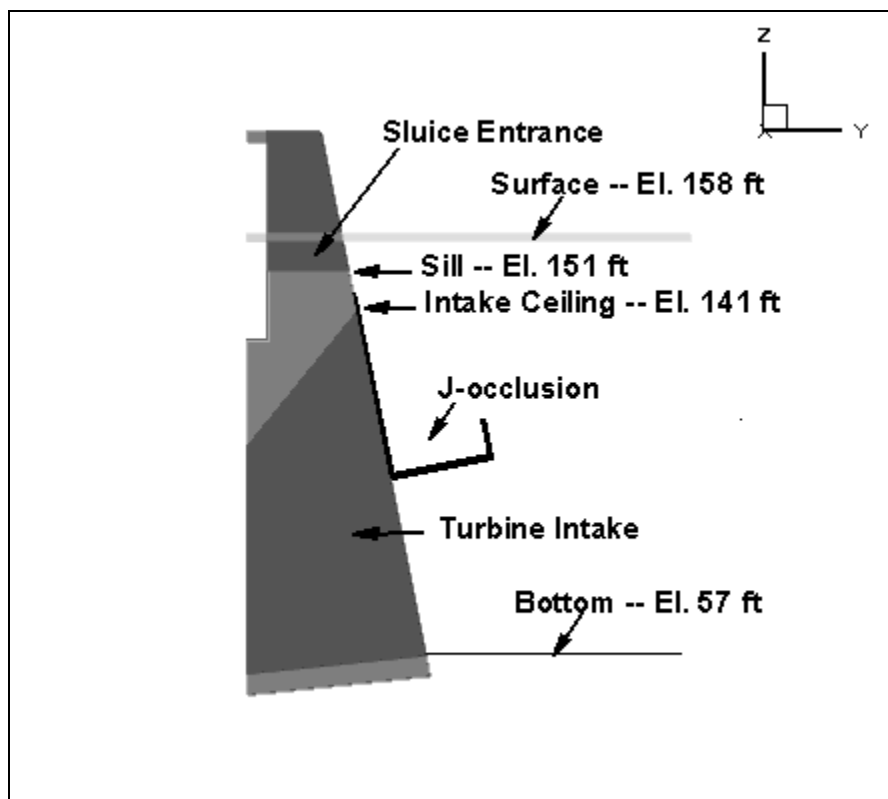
Sectional View of The Dalles Dam Powerhouse Showing Sluiceway Entrance, Sill, Intake Ceiling, J-Occlusion, and Turbine Intake
